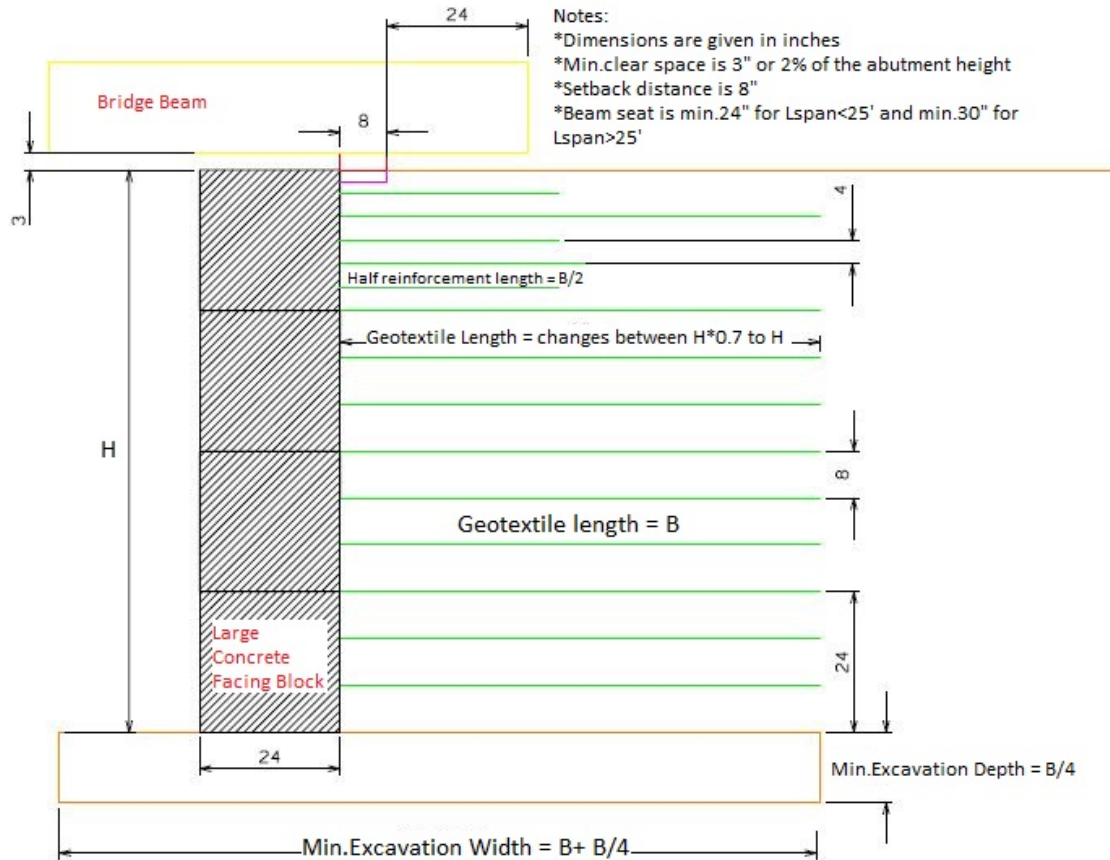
Suggested schematic cross-section of GRS Abutments with large concrete block facing with related construction notes from FHWA guidelines (Adams *et al.* 2012, 2018)
